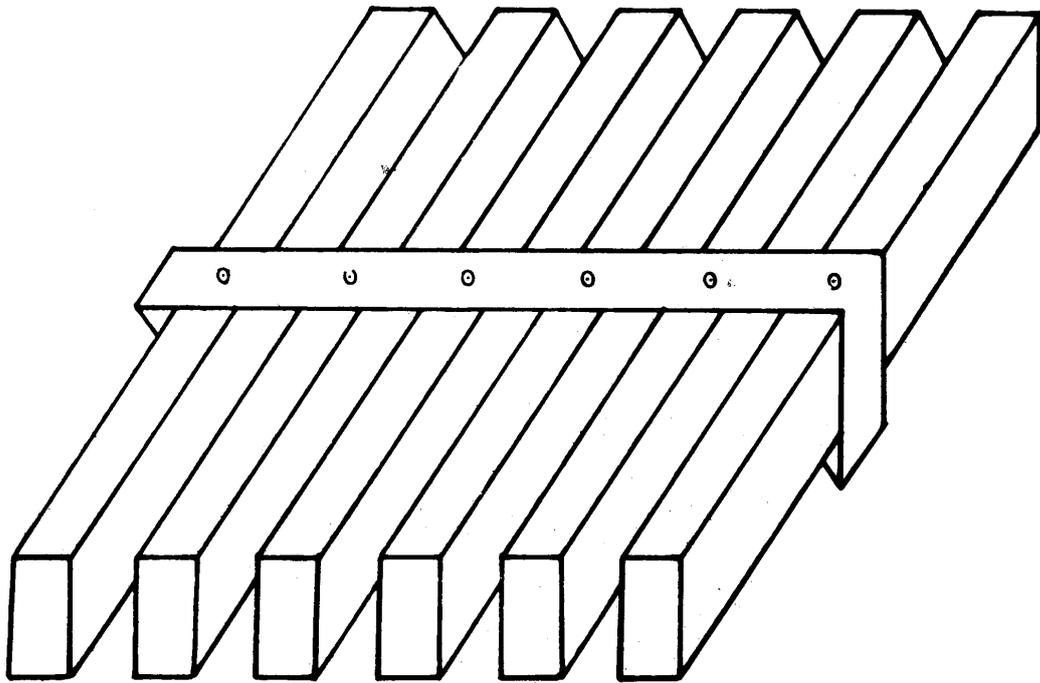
(a): PLATE BANKS ARRANGEMENT FOR CEILING MOUNTING
